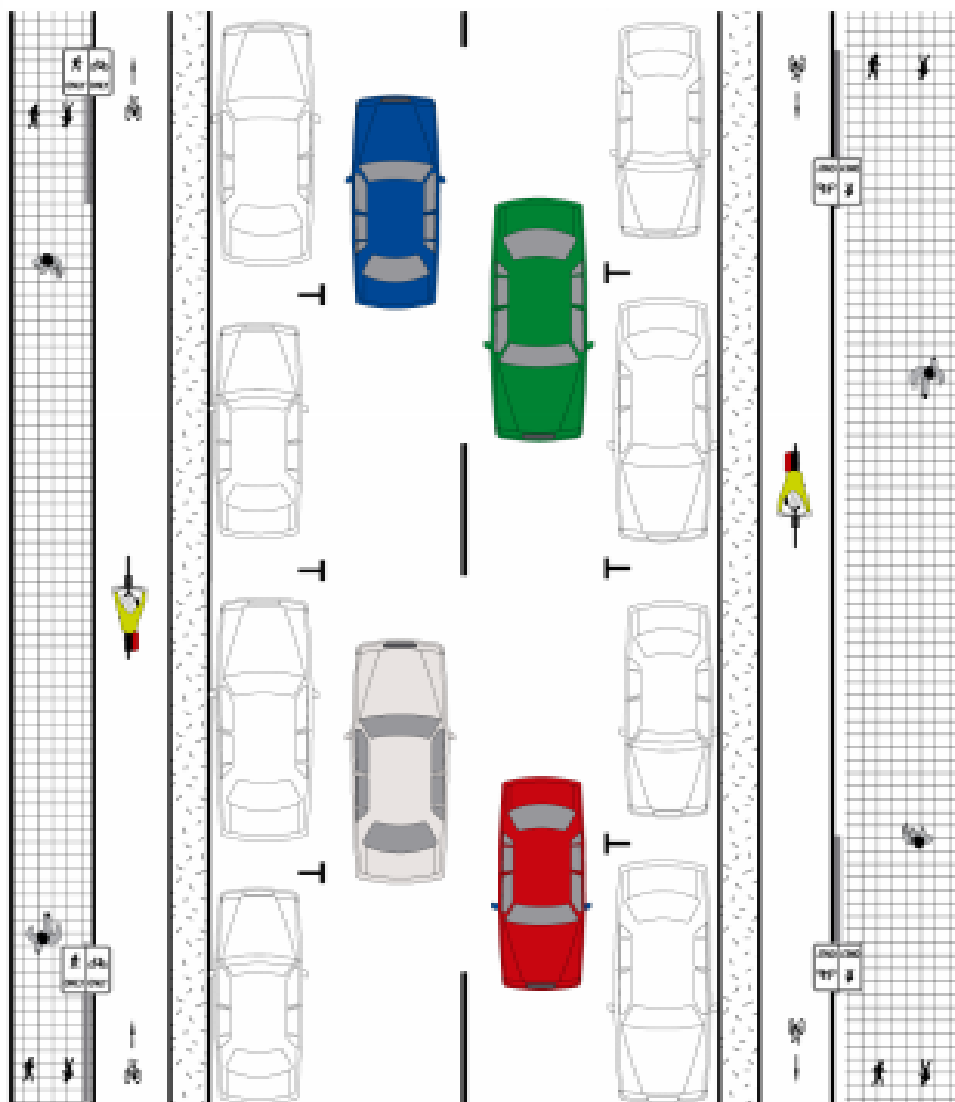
below present an example a single carriageway cross section with parallel parking and separated pedestrian and cyclist paths.
